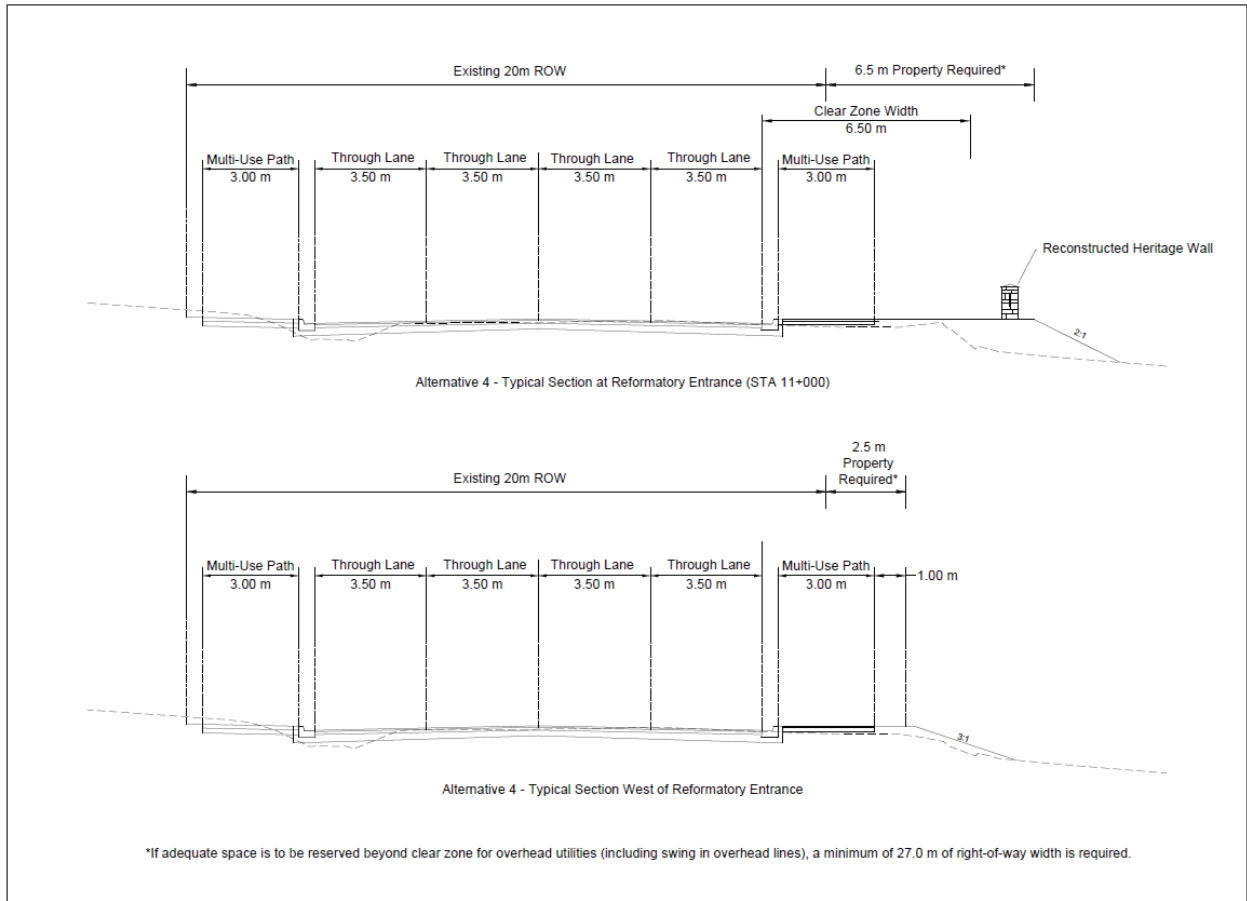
Typical Roadway Cross-Section for York Road Alternative 4.
